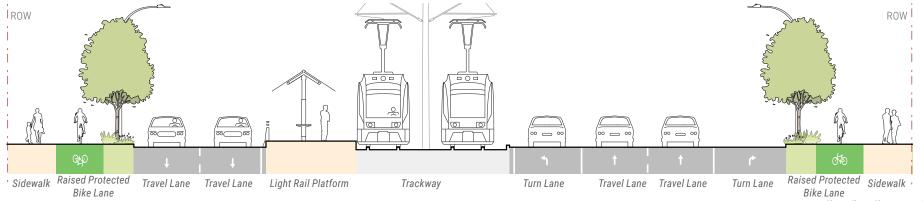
DRAFT 19th Avenue Station Cross Section
